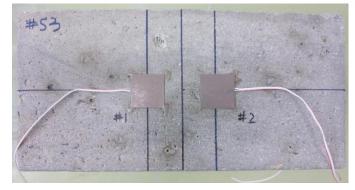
Layout of PZT sensors on the concrete specimen surface.
